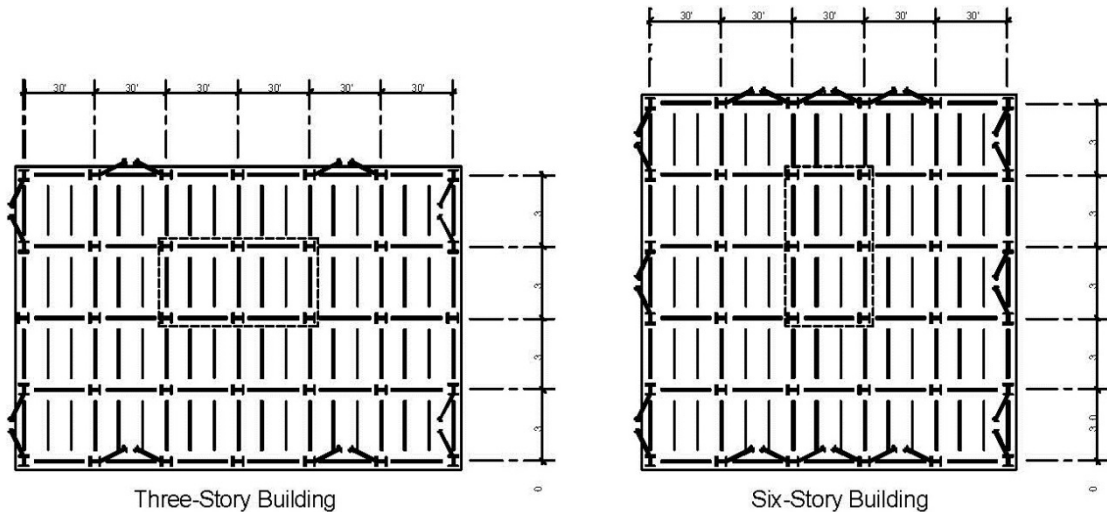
Plans of Three-Story and Six-Story Buildings (Sabelli 2001)
